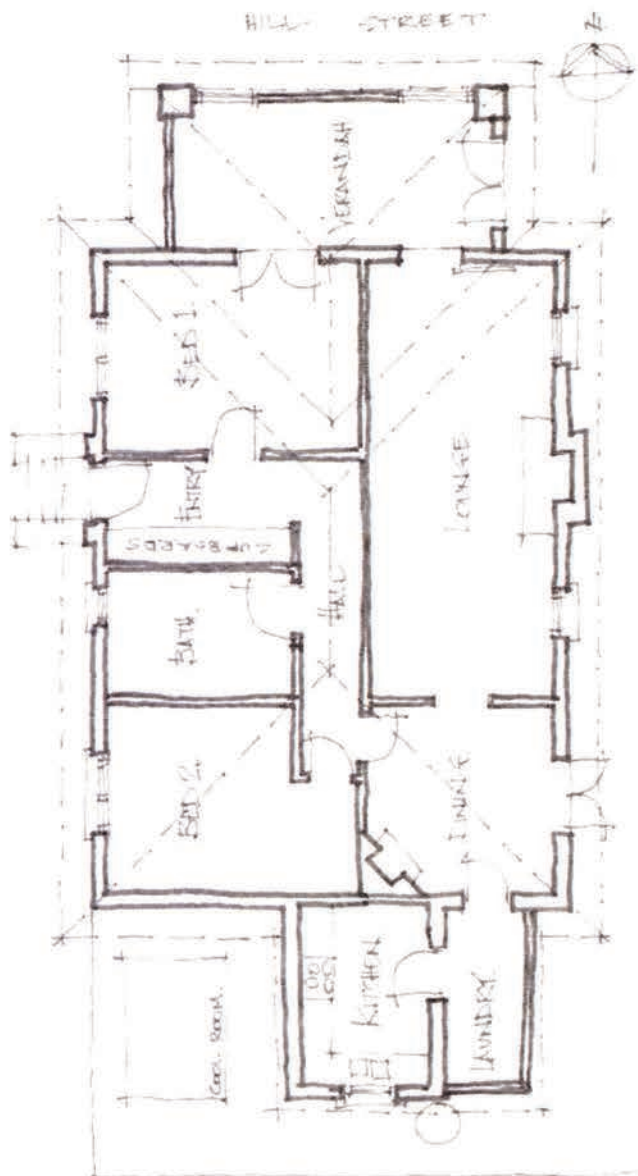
Plan diagram of possible house layout (J. Carr - not to scale.)
